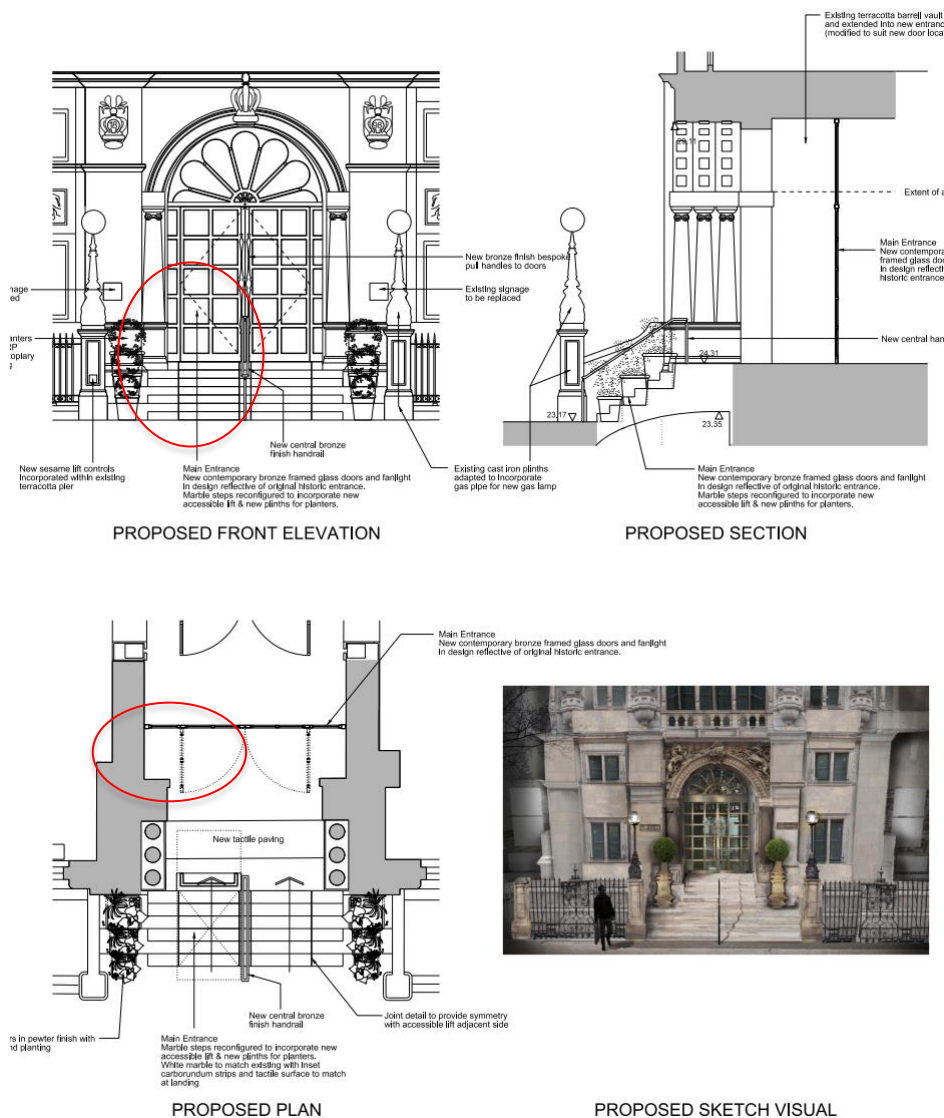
Extract from approved elevation – Hotel Russell/ Fitzroy Kempton (2015/1673/P)
